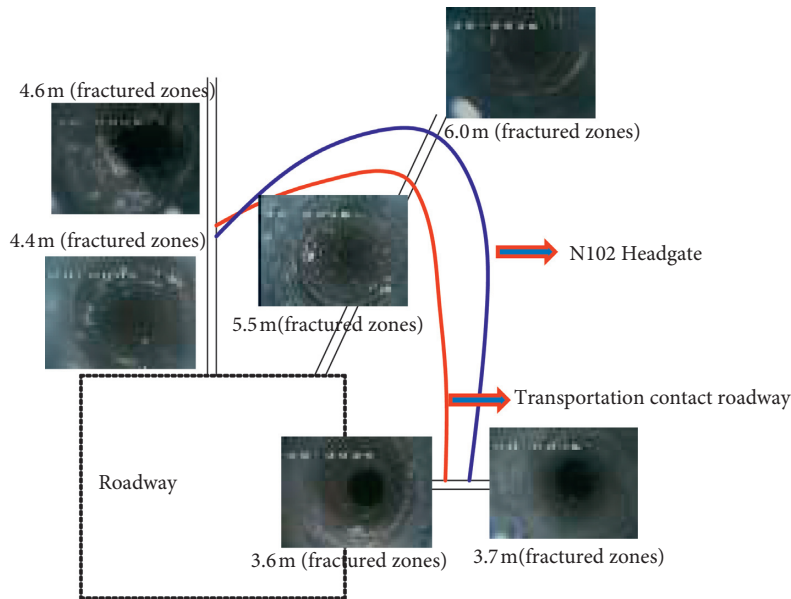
Drilling and peeping of the surrounding rock of the roadway.
